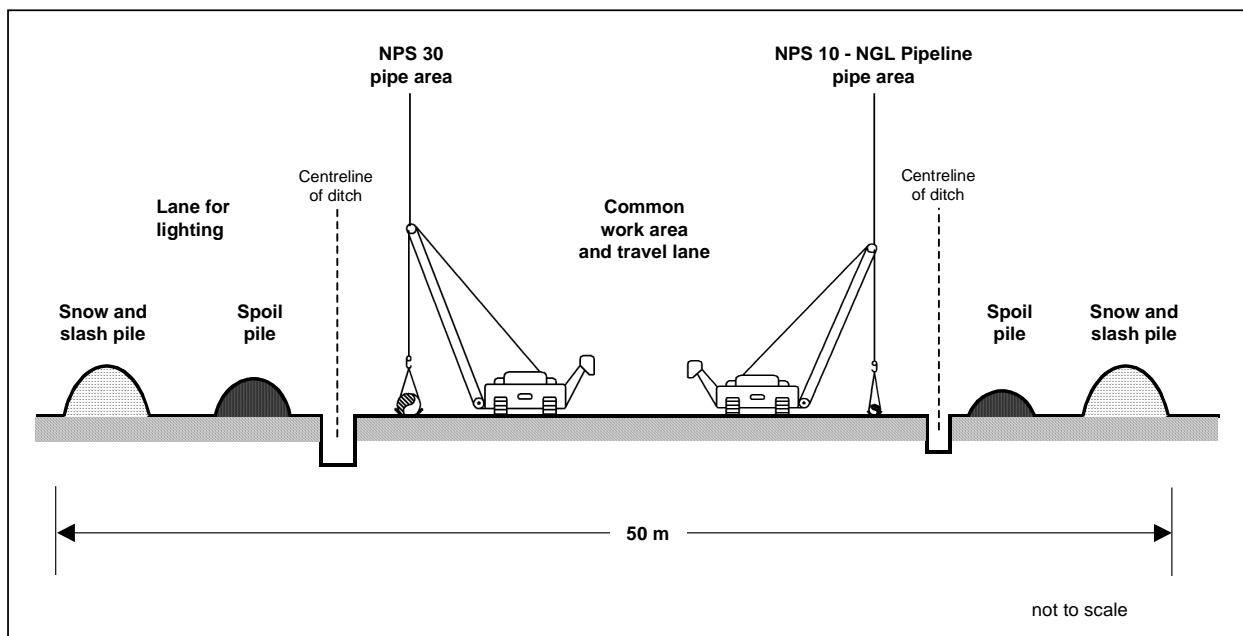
Right-of-Way for Constructing Two Pipelines
